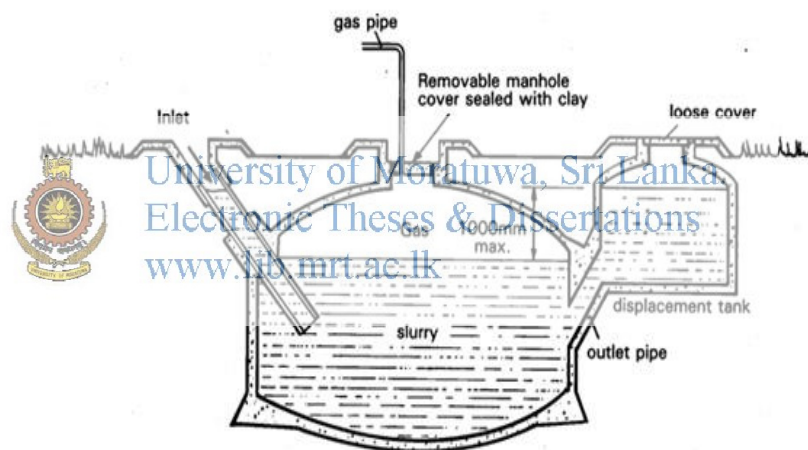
Fixed-dome Biogas Plant (Ewings, 2014)
